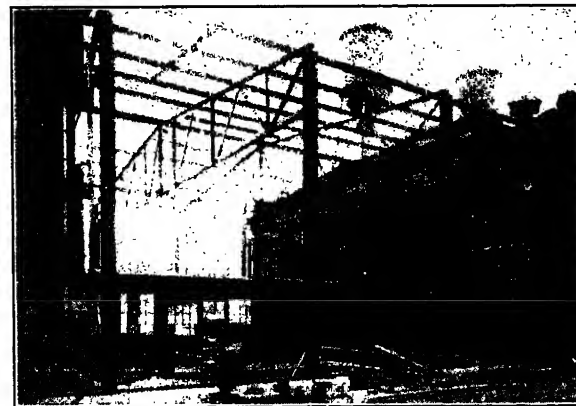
WELDED TRUSSES ERECTED IN POSITION BETWEEN OTHER BUILDINGS
